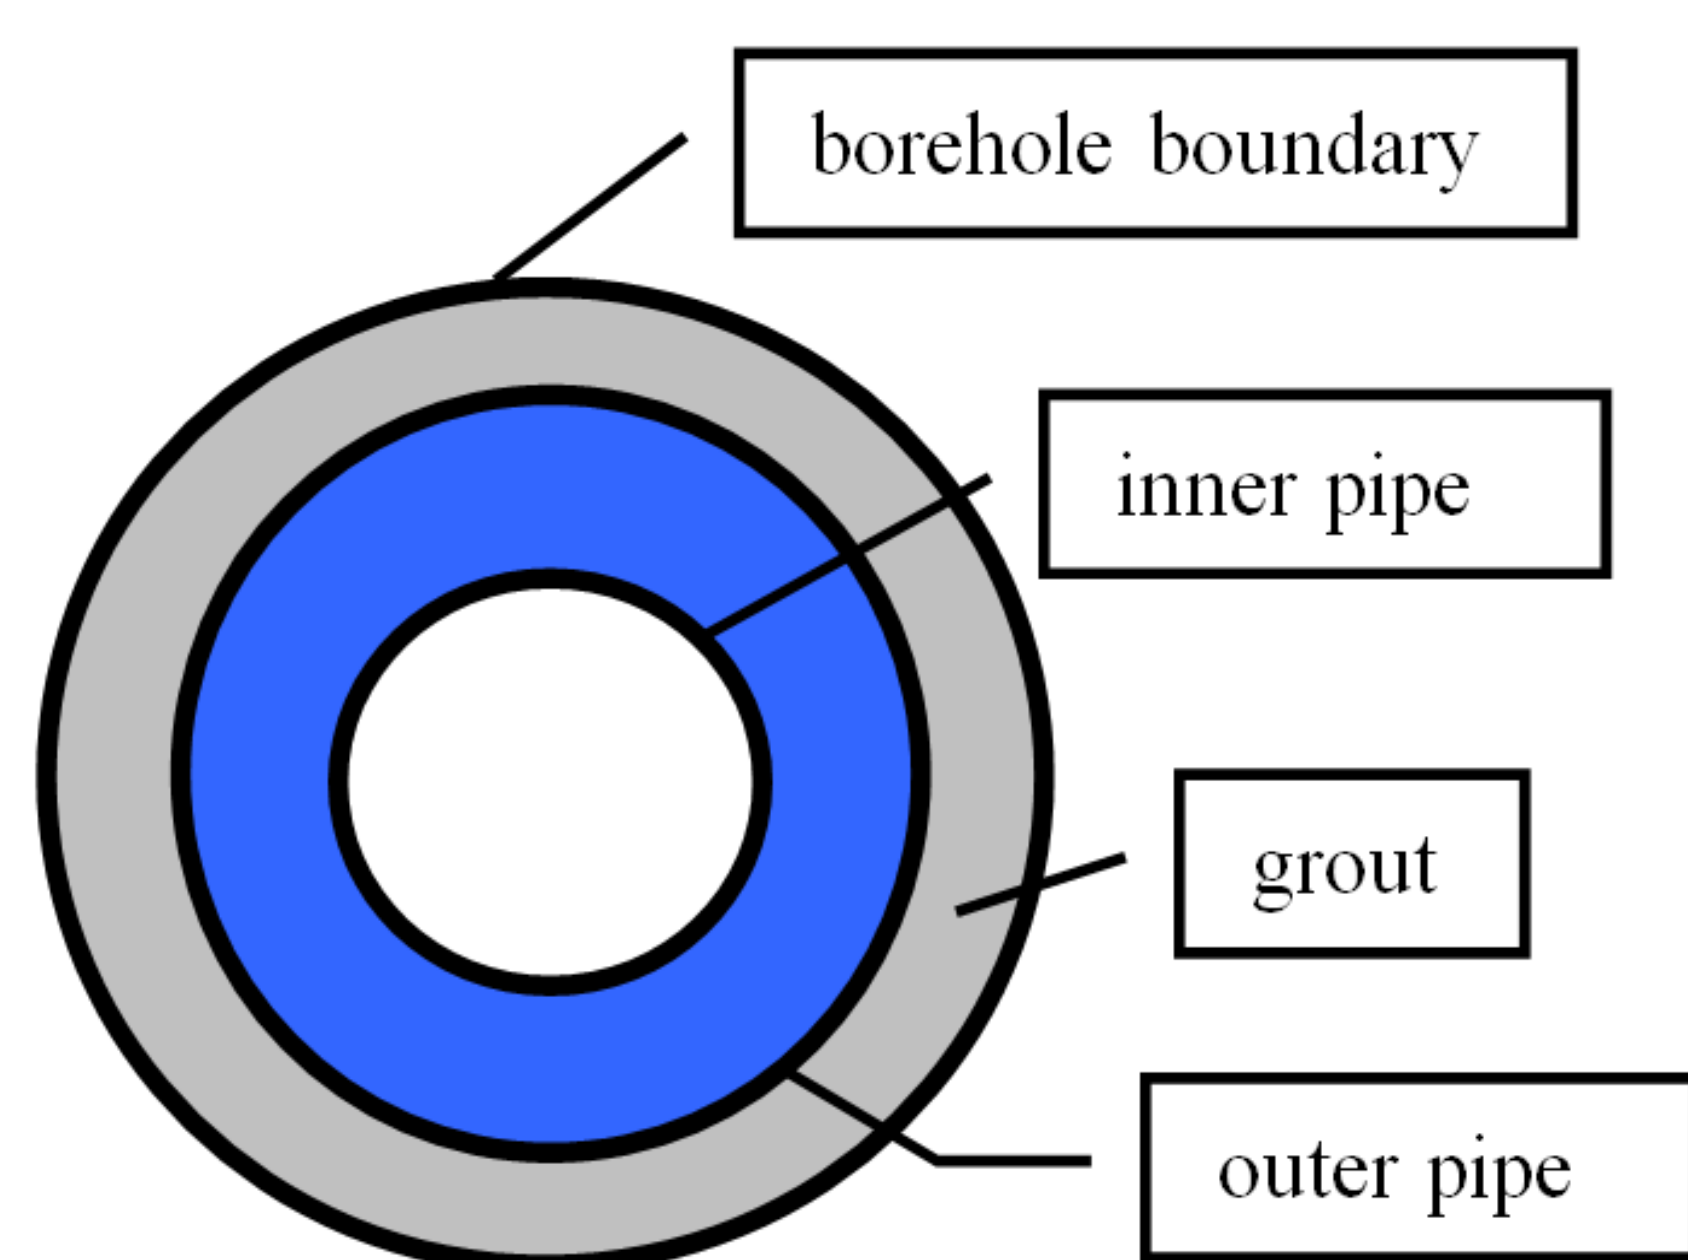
Sketch of cross-section through a co-axial heat exchanger
